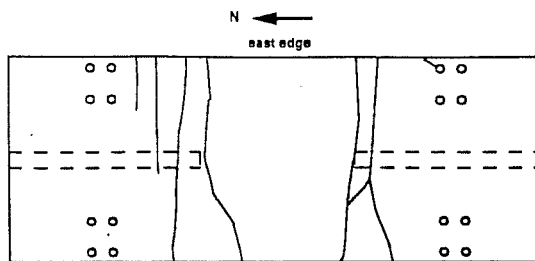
Sp. 2b: Progression of Cracking of Top Face of Roof Slab at Load Point 141
